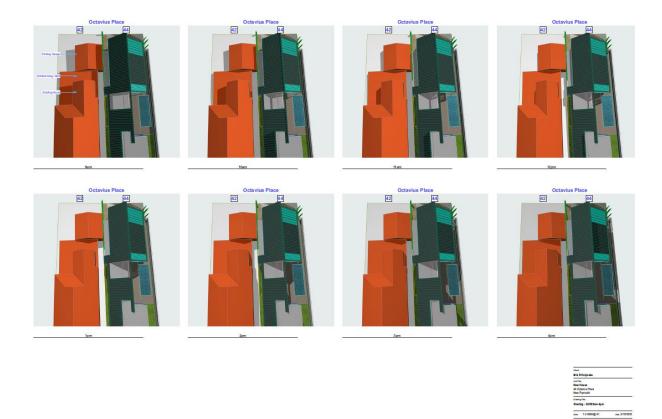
Shading Assessment (Source: Applicant plans; drawing number A406, dated 3/10/2020)
